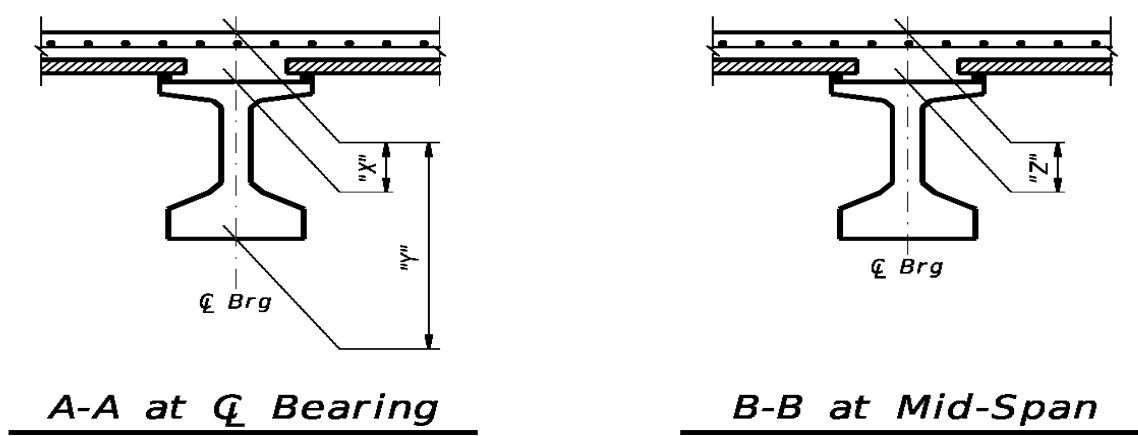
"X", "Y", and "Z" Dimensions in Section View
